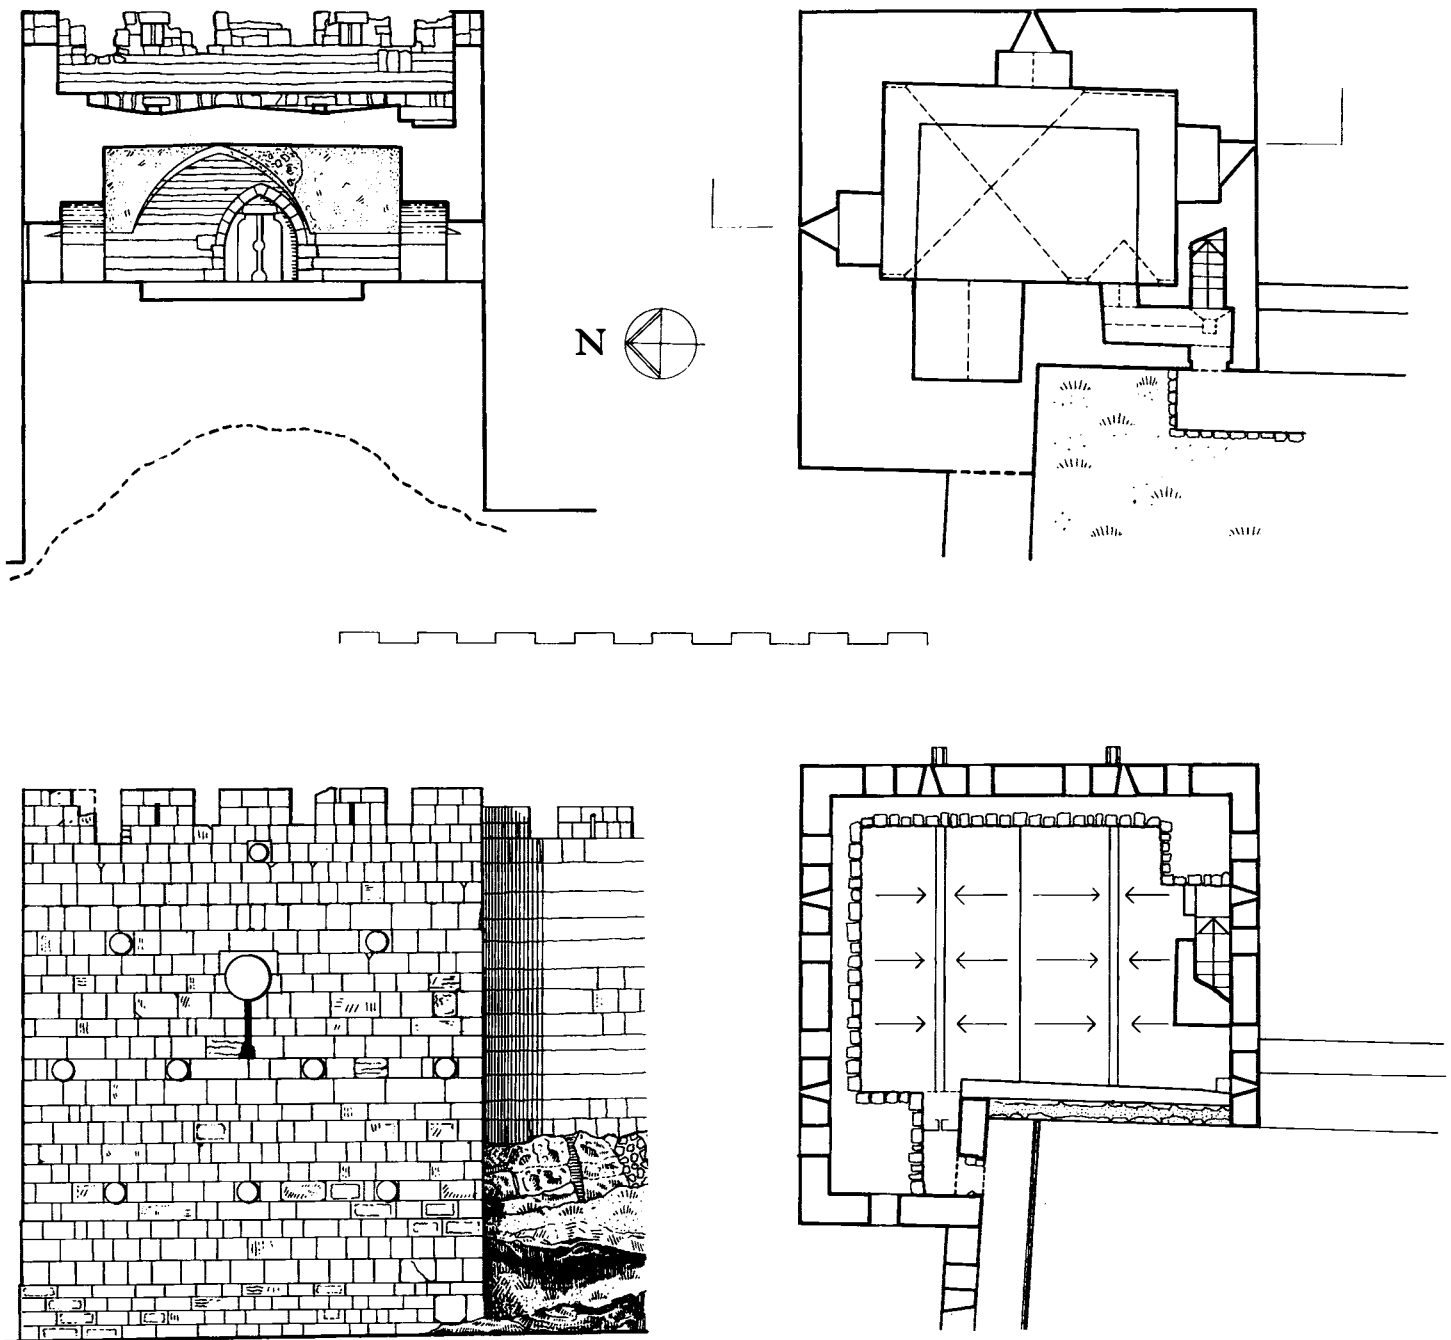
Burj Laqlaq (1)—N-S section; ground plan; north elevation; roof plan; and east elevation.
